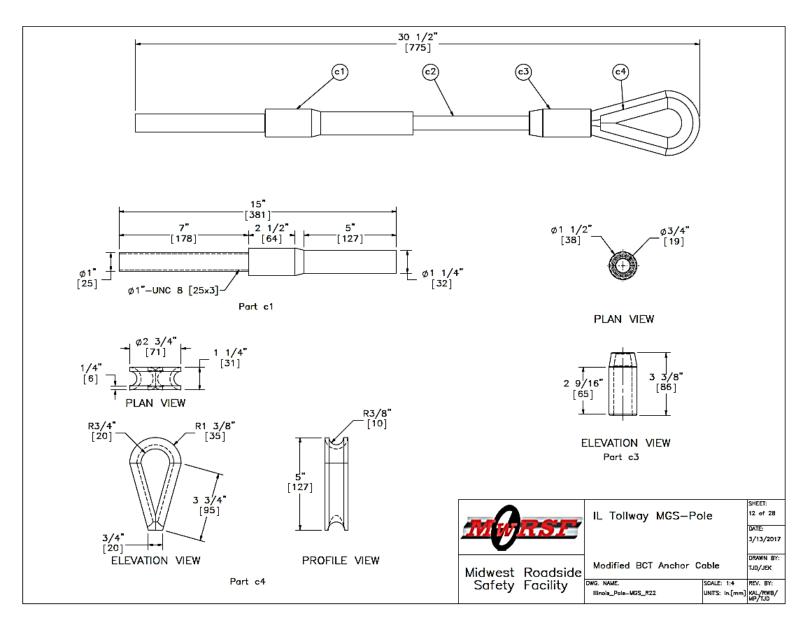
Modified BCT Anchor Cable, Test No. ILT-1
